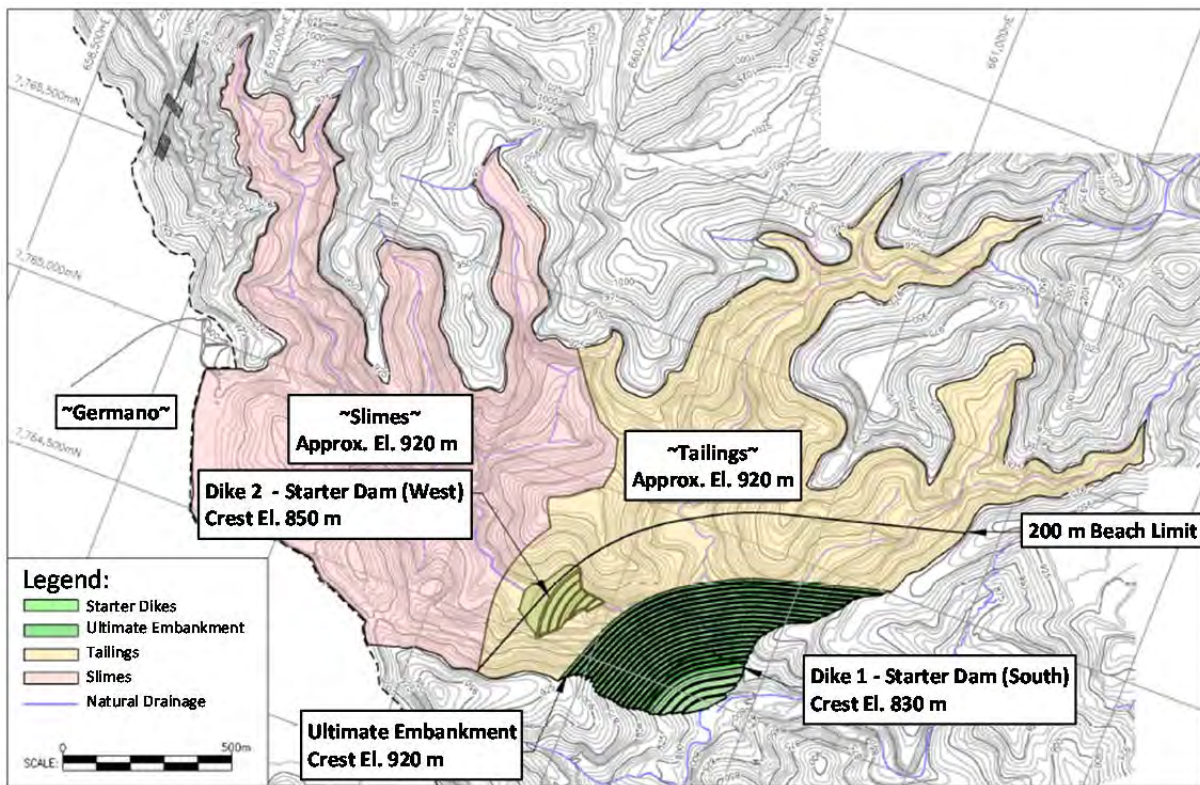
Concept design Fundão Dam final elevation 920 m
